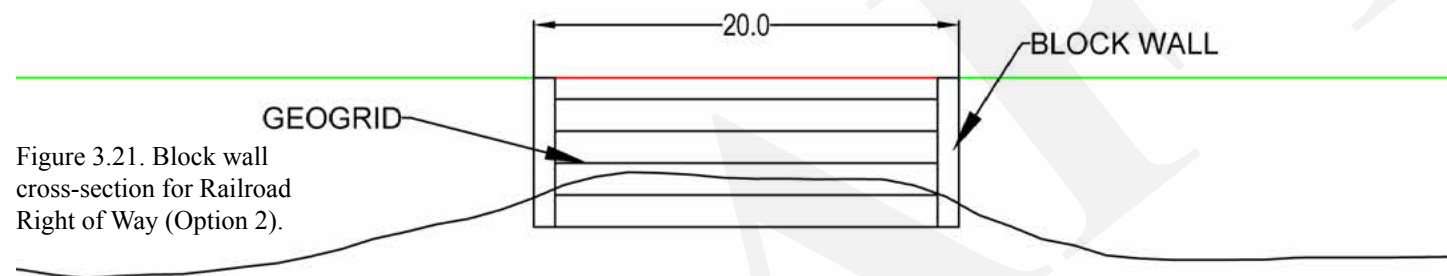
Block wall cross-section for Railroad Right of Way (Option 2).
